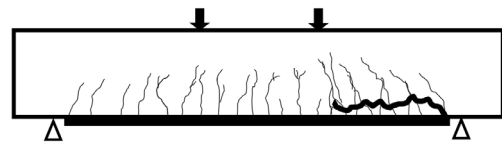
Concrete cover separation of an RC beam strengthened with externally bonded reinforcement
